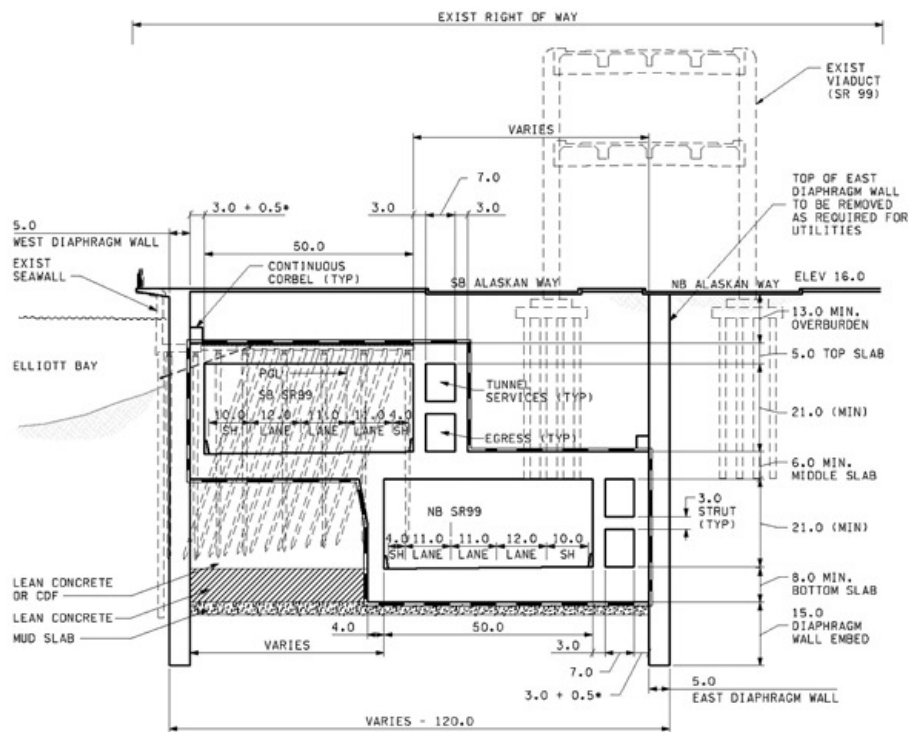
Tunnel Cross Section at Transition Near University St. [Kirandag et al. 2007]
